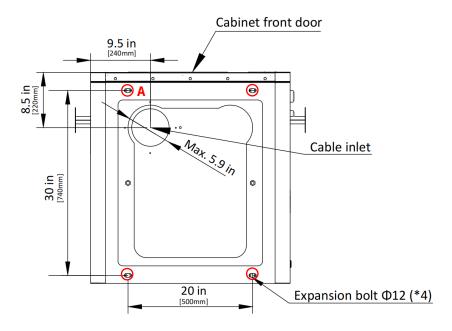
Drill Screw Holes for Expansion Bolts Fixing the Charger
